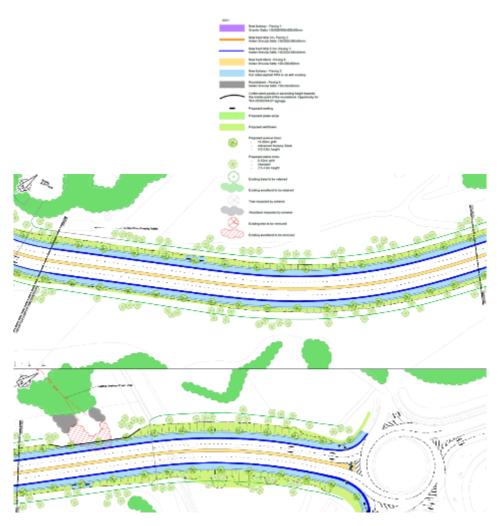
Landscape design for broad boulevard to Sports facility roundabout
